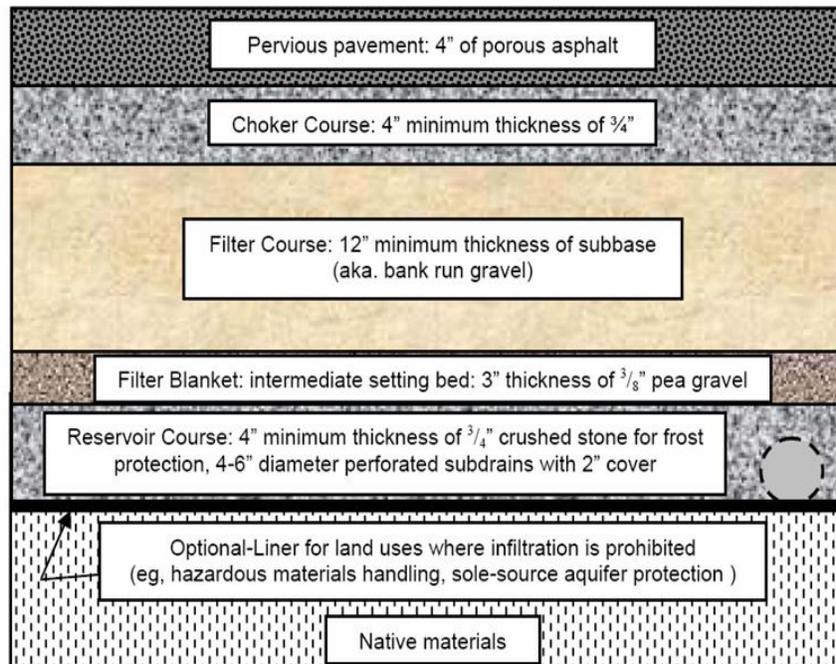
Typical Cross Section of Pervious Pavement System (UNHSC 2008)
